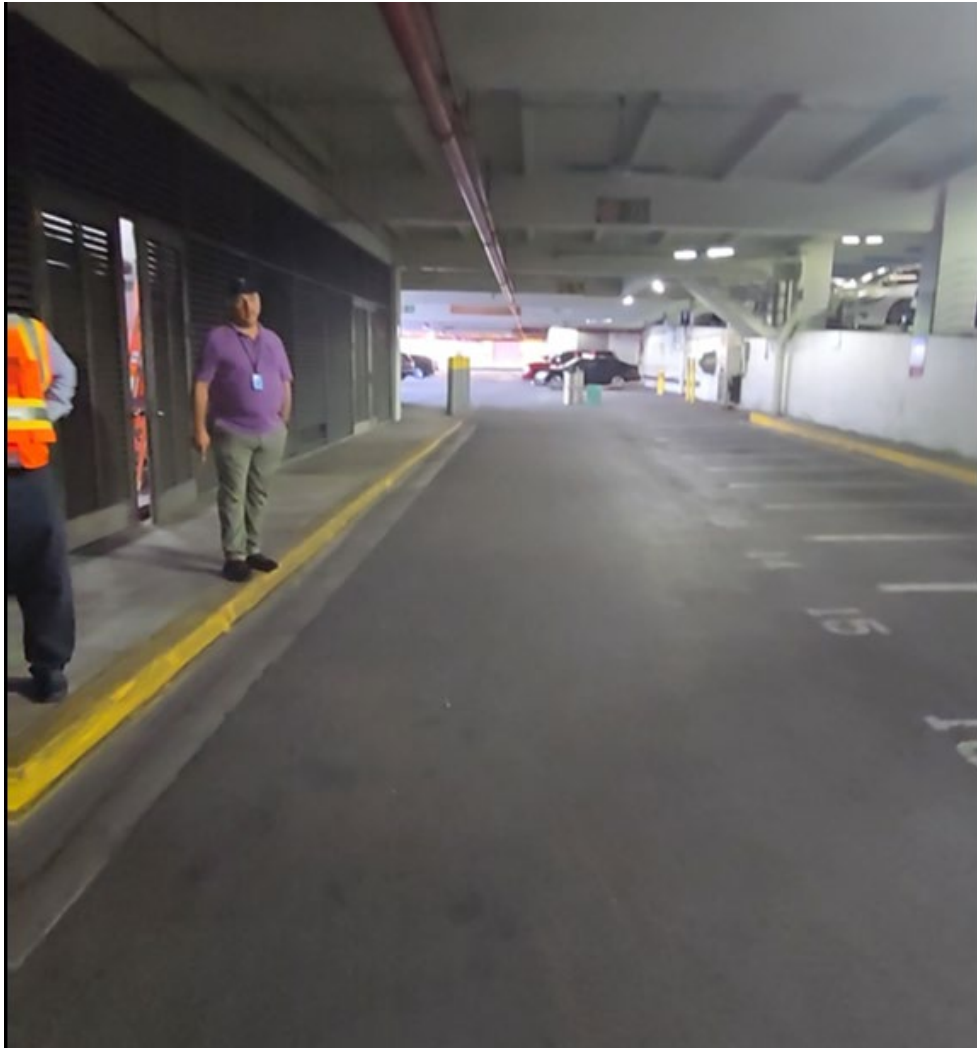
Area outside of electrical/switchgear rooms to east, in parking garage. Facing north.
